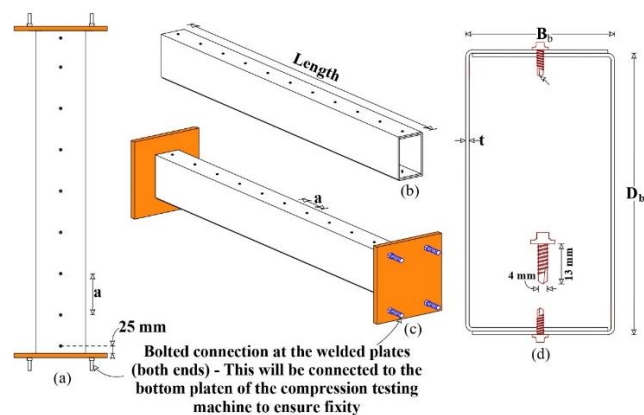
Cold formed steel face-to-face connected built-up columns: (a) Full View of the Built-up column; (b) 3D view of the column; (c) 3D view of the column with base plates; (d) Dimensions of the CFS built-up column cross-section
